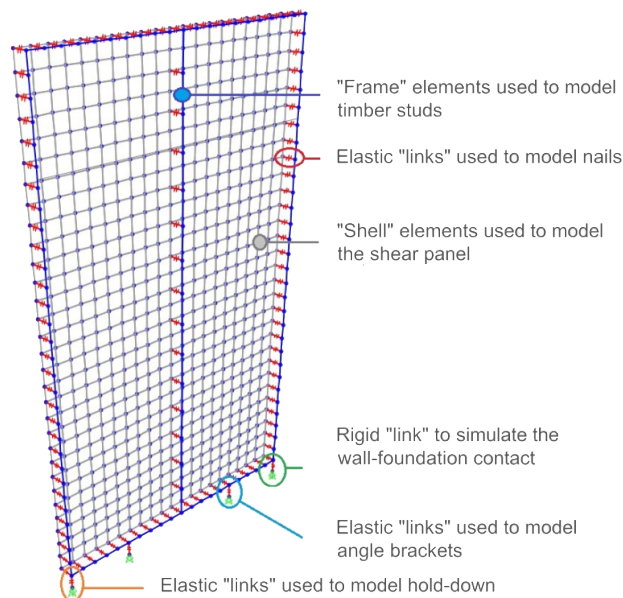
Example of an intricate modelling technique for a timber frame wall in a finite-element software.
